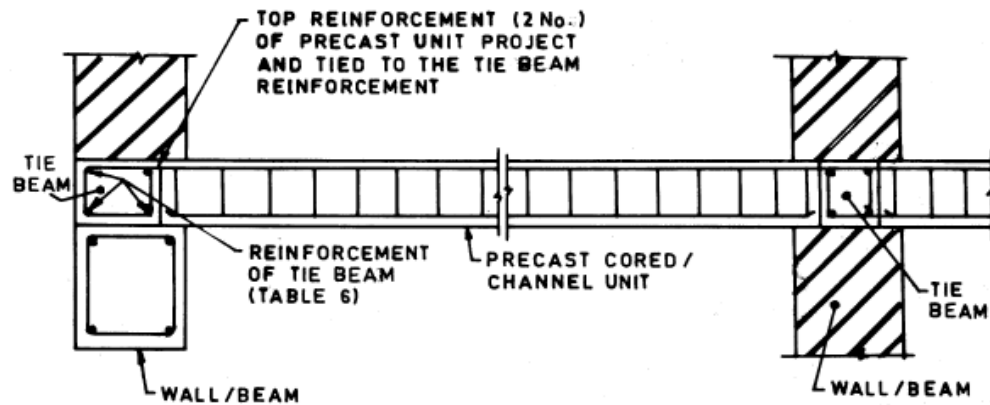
CONNECTION OF PRECAST CORED/CHANNEL UNIT WITH TIE BEAM
